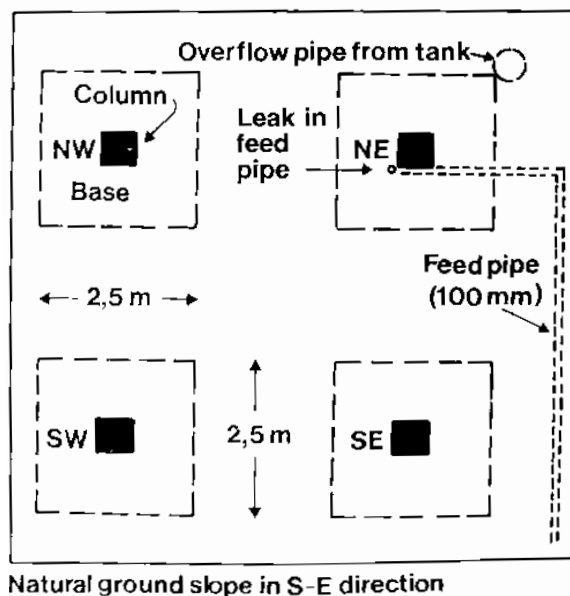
Foundation plan of White River water tower (Brink, 1979)
